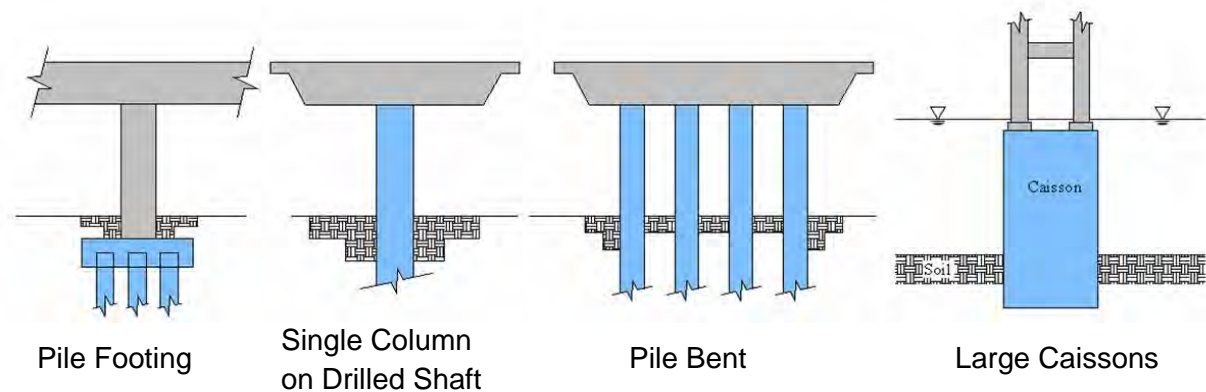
Typical Structural Forms for Bridge Foundation Systems
